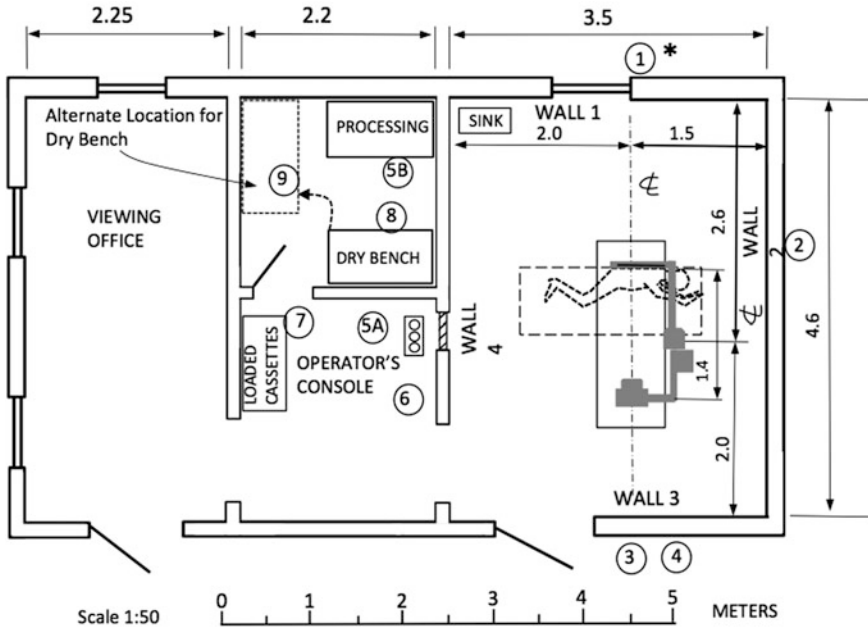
Simple layout for an X-ray installation in a rural health center. Adapted from [21]
